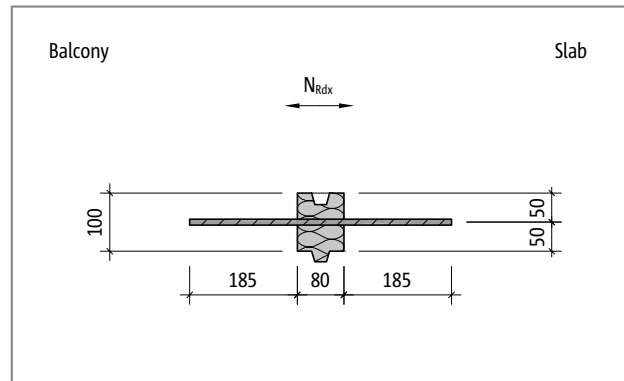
Schöck Isokorb® T type H-NN1: Product layout
